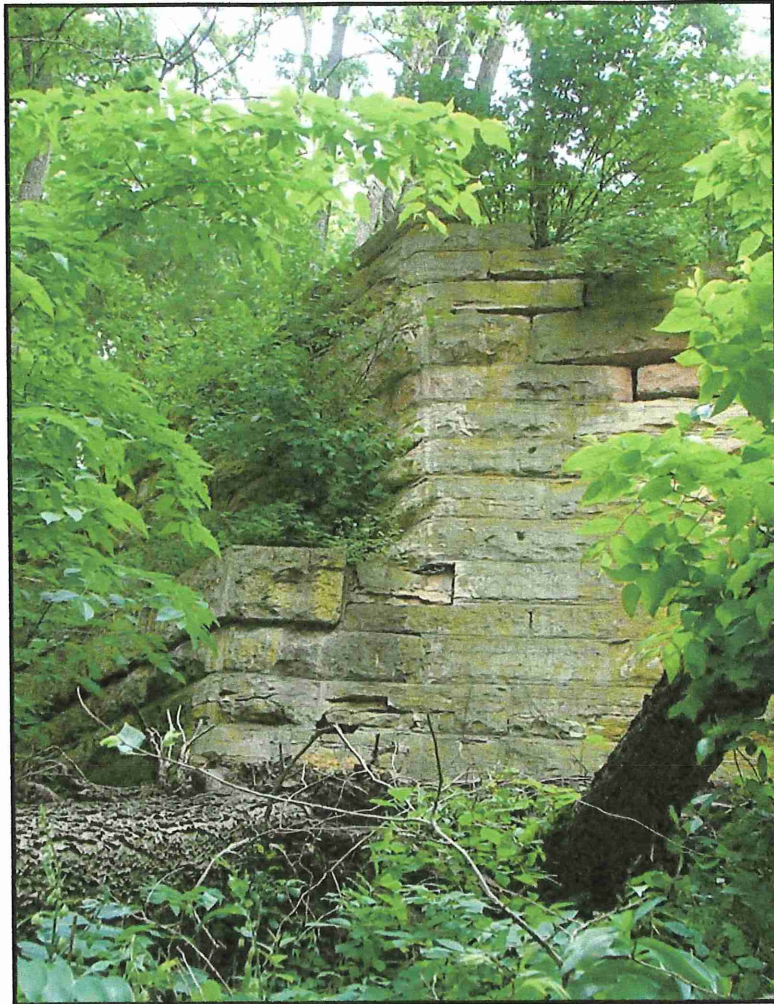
WINONA AND ST. PETER RAILROAD BRIDGE ABUTMENT, VIEW TO NORTHWEST
